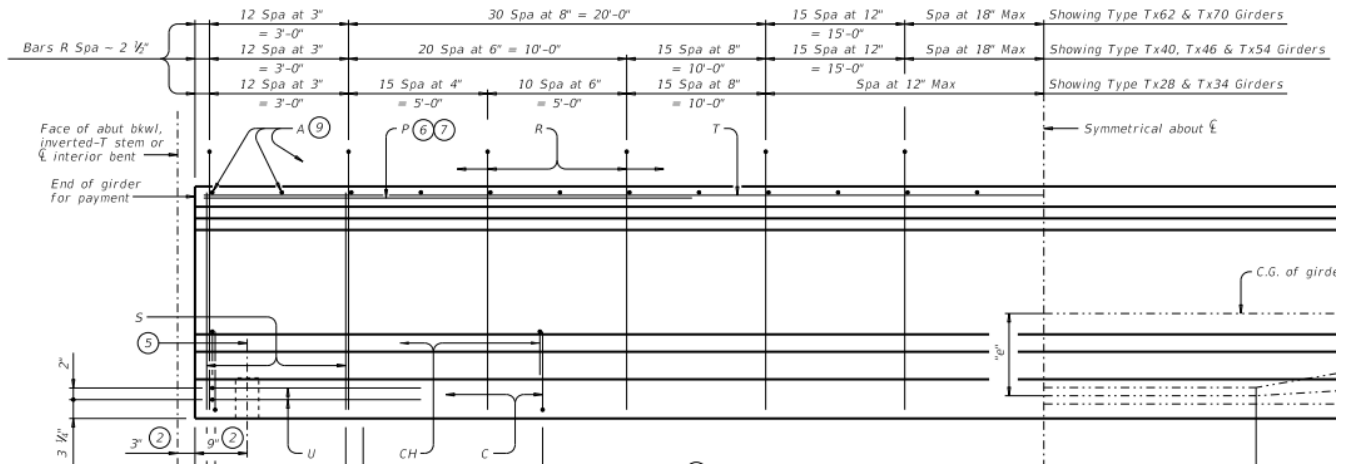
9: Typical spacing of shear rebars of TxDOT girders
